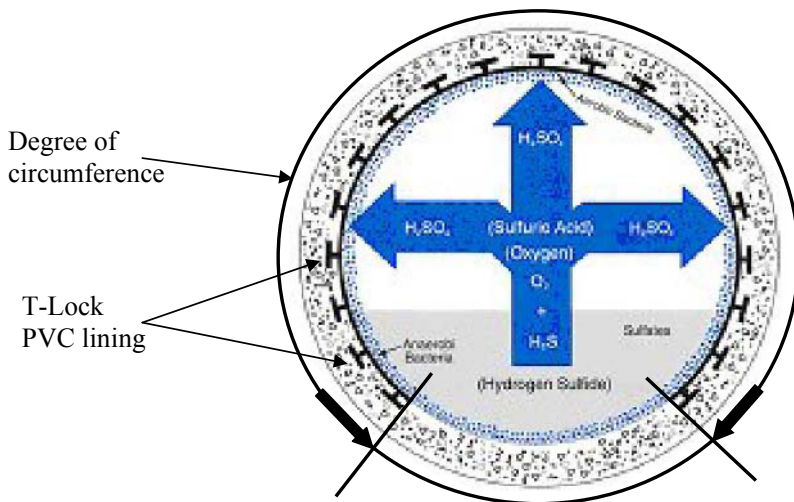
Cross-sectional view of reinforced concrete sewer pipe with T-Lock liner (Ameron 2001)
